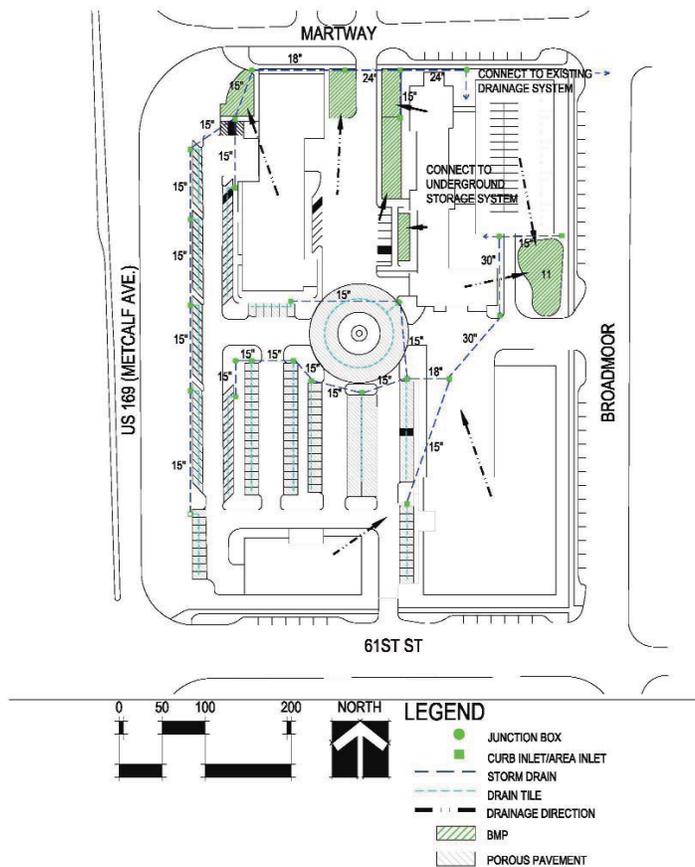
Metcalf Avenue Mixed-Use Development: LID Site Layout
